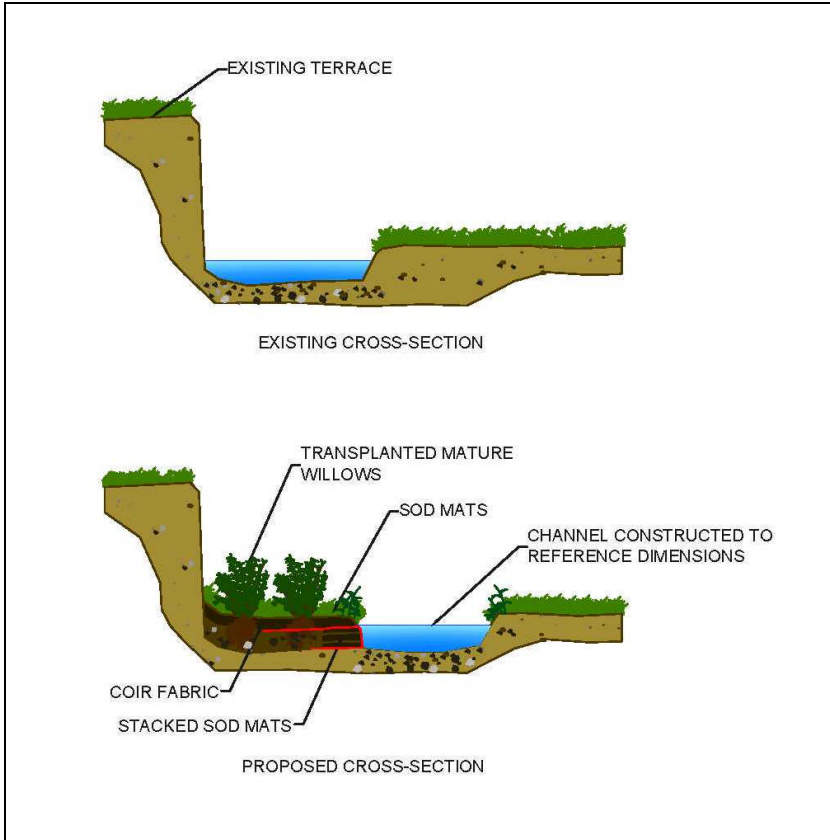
Bioengineered bankfull bench adjacent to eroding terrace
